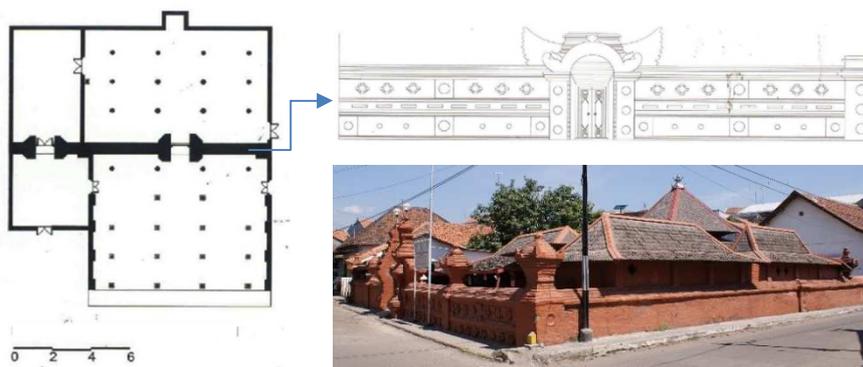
The *Panjunan* Mosque, plan and wall-partition [14] [17]
